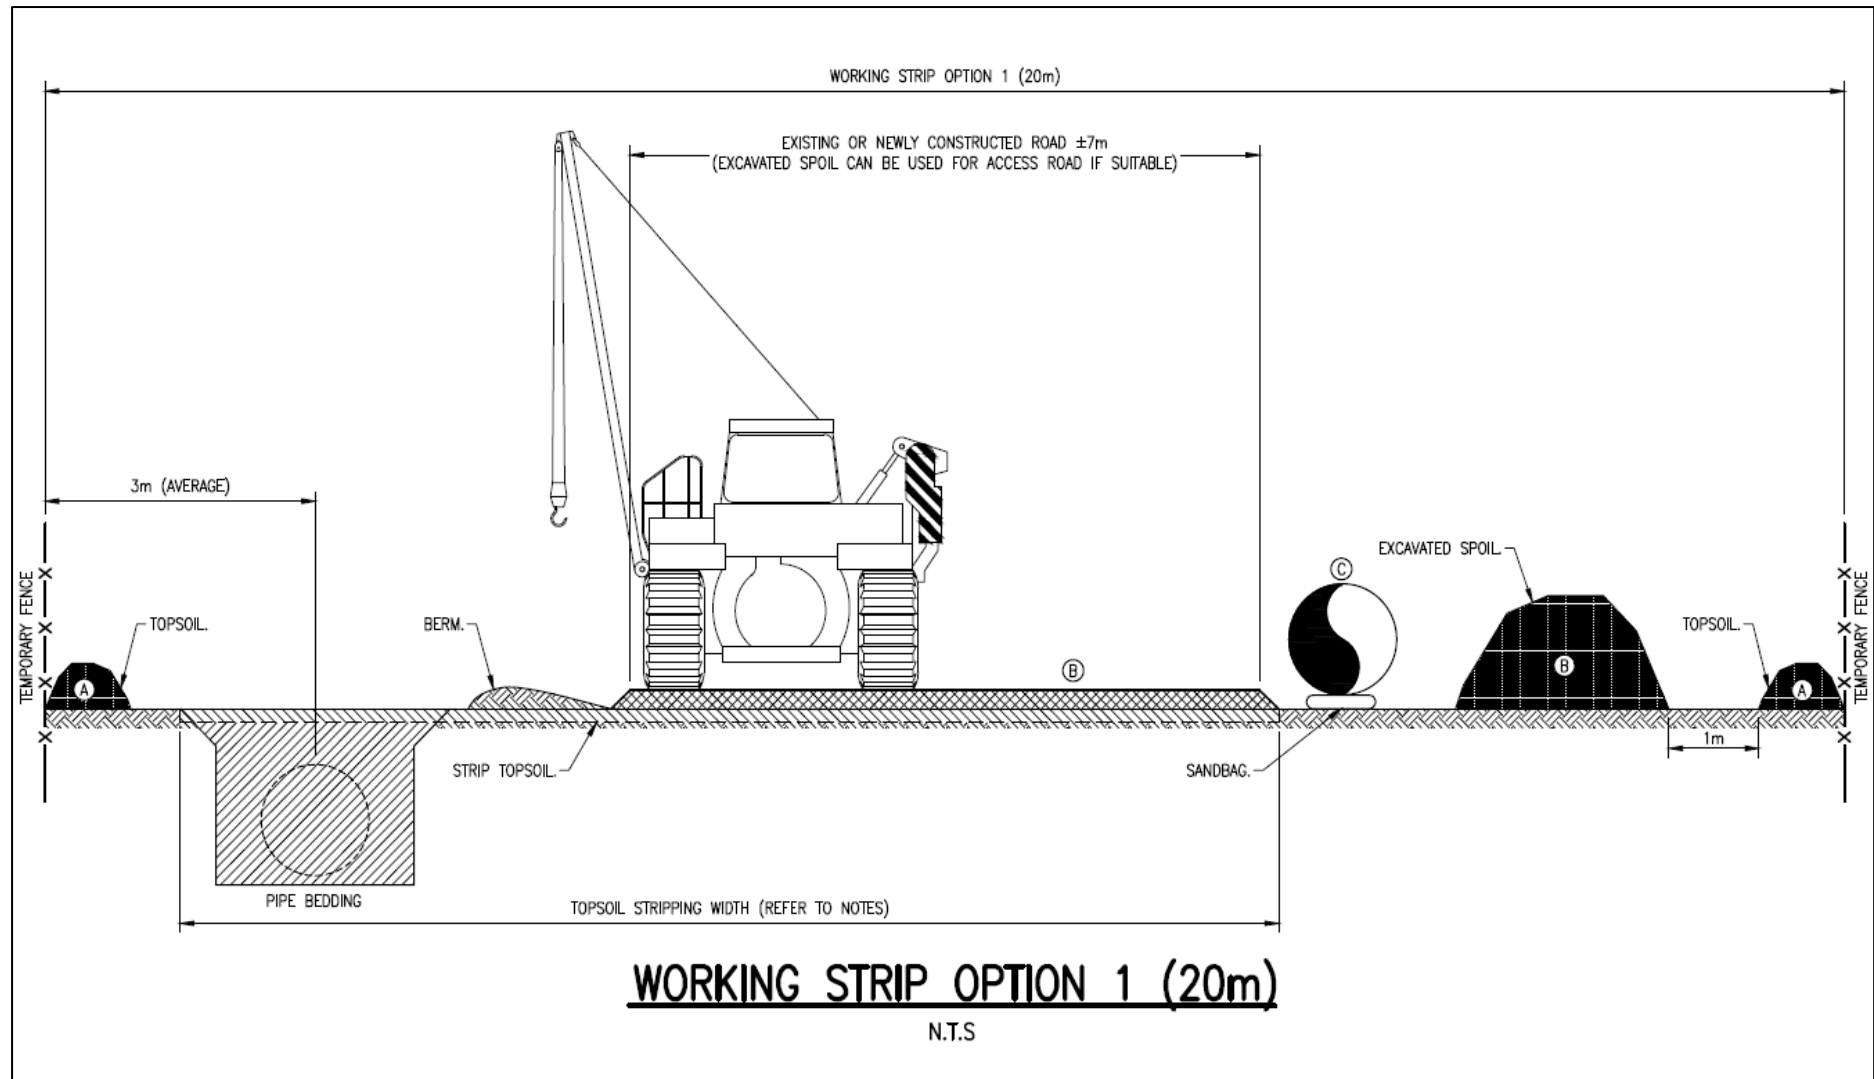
Typical construction servitude cross-section (Note: not specific to VGRWSS-II – merely indicative)
